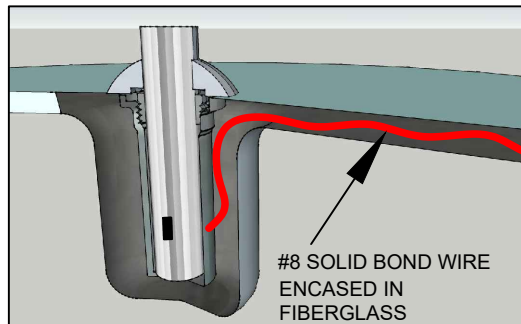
DETAIL REFLECTS ANCHOR INSTALLATION IN NESPA SHELLS ONLY.
